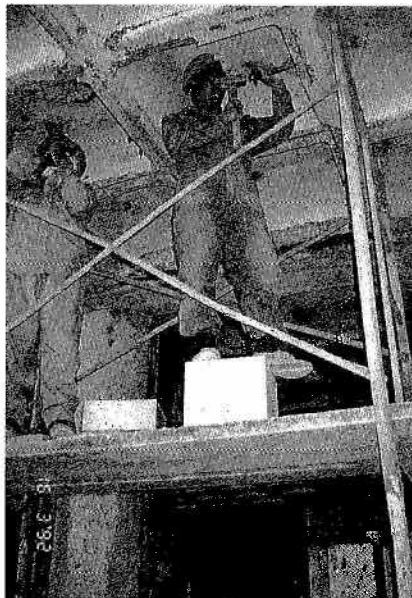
Removal of loose concrete from fire damaged waffle slab in preparation for gunite repairs.
